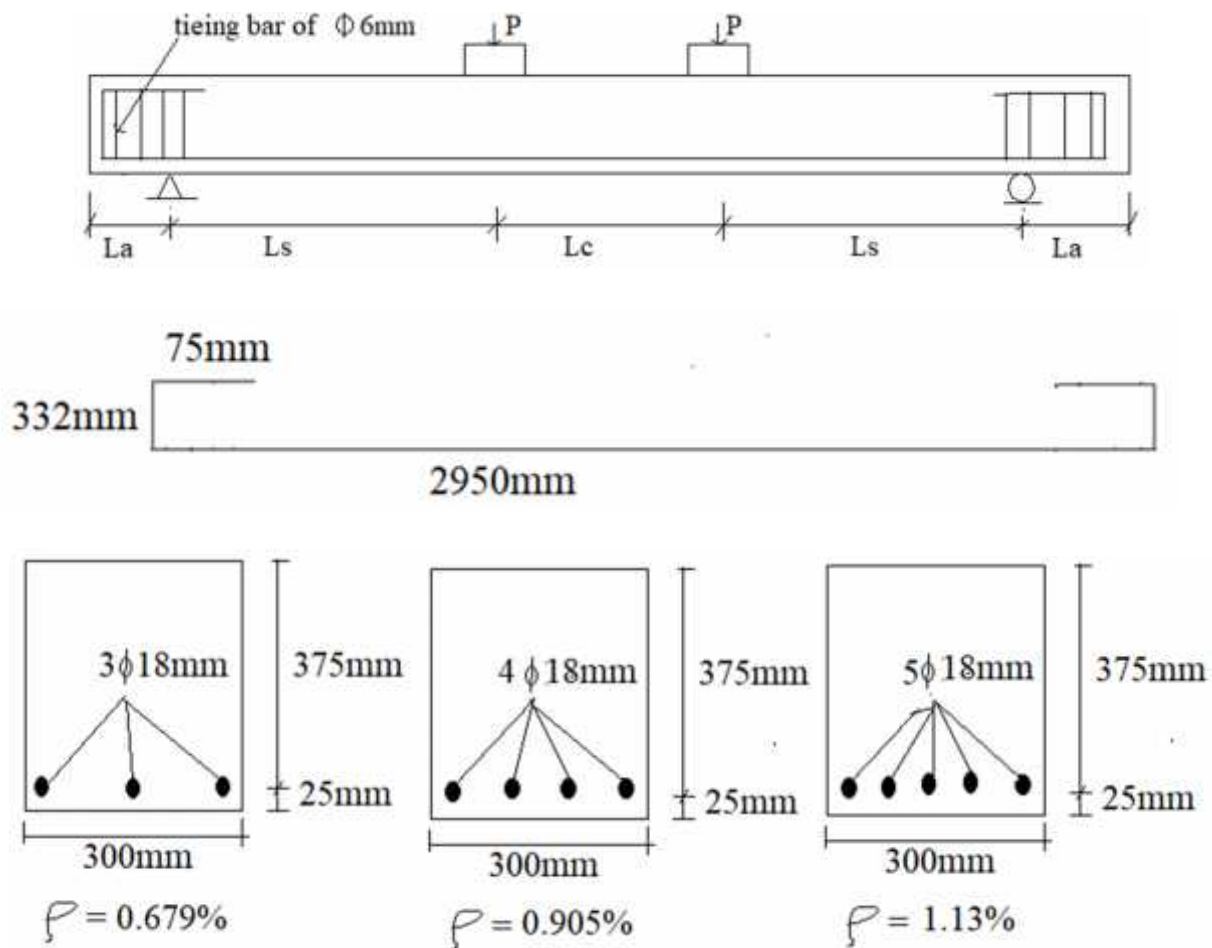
Sample of RC beam profile and longitudinal rebar scheme
